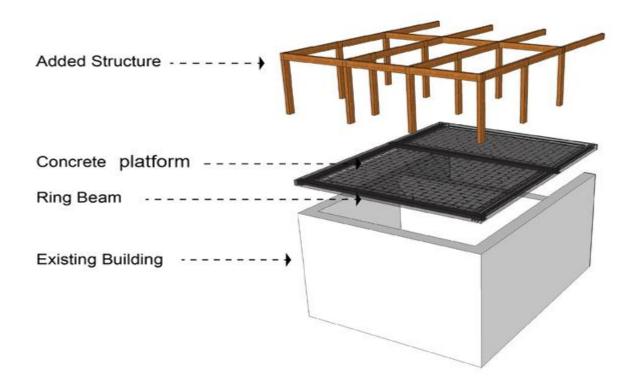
Load distributing through a platform made of reinforced concrete[8]
